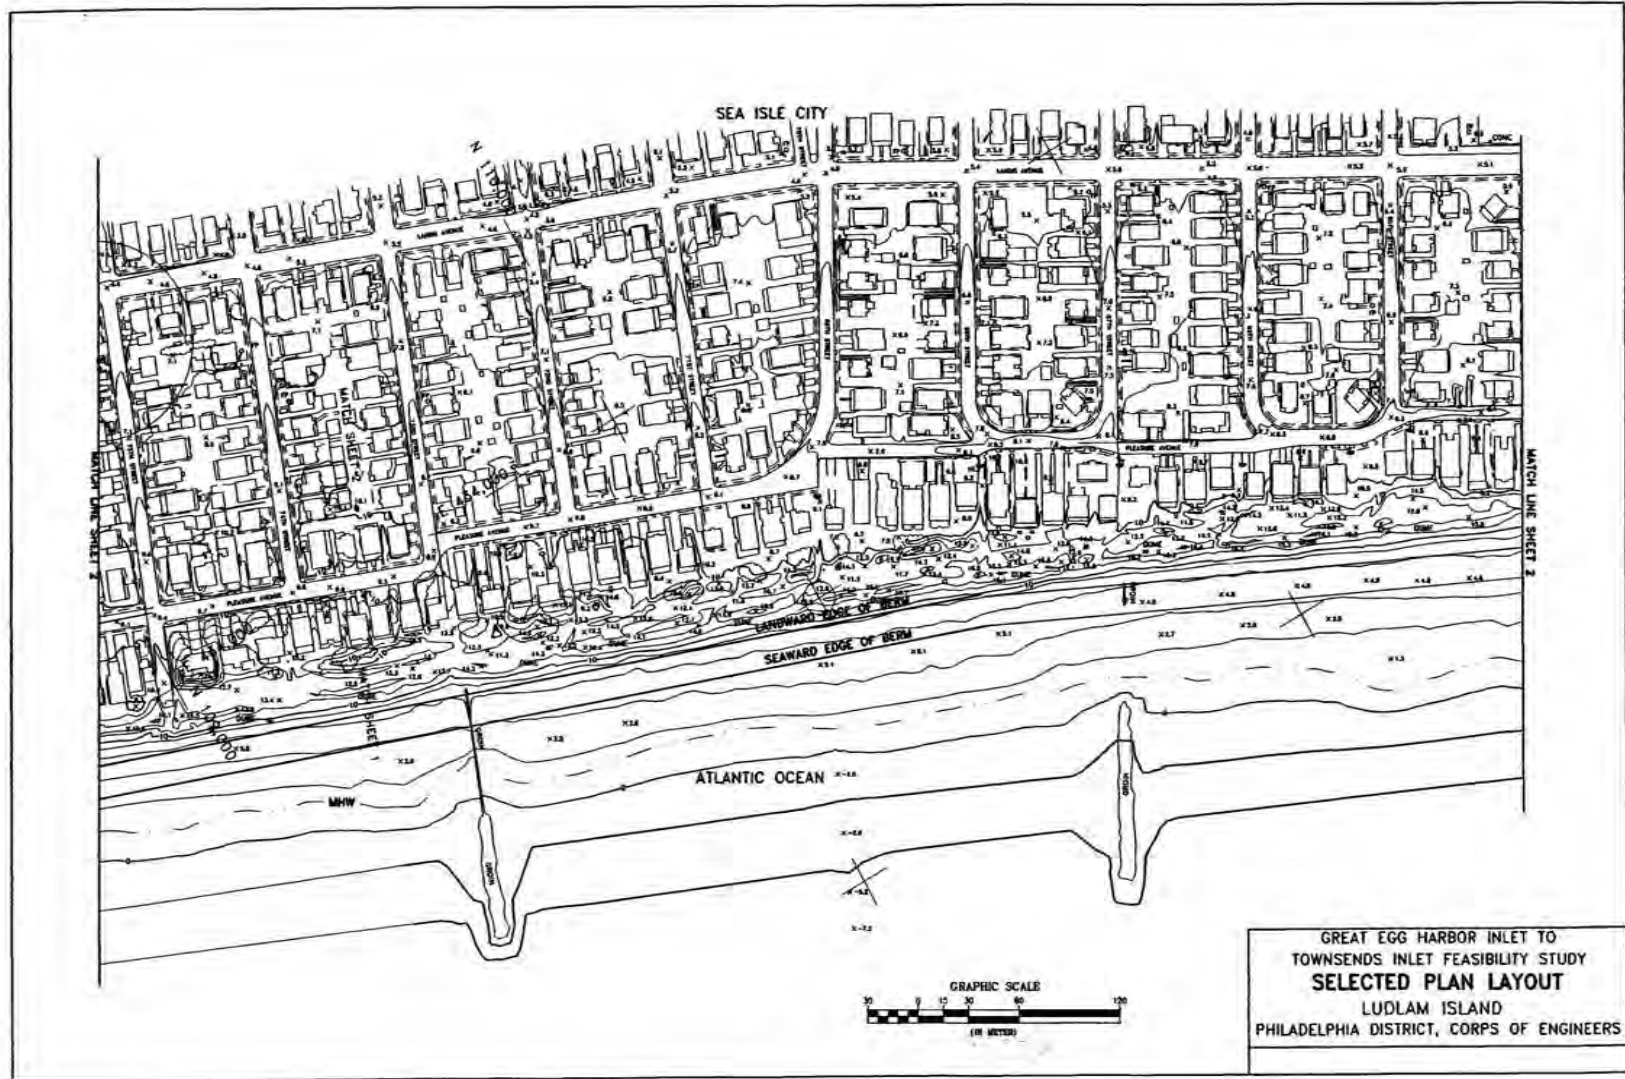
Selected Plan Layout for Ludlam Island, NJ – 65th Street to 75th Street, Sea Isle City
